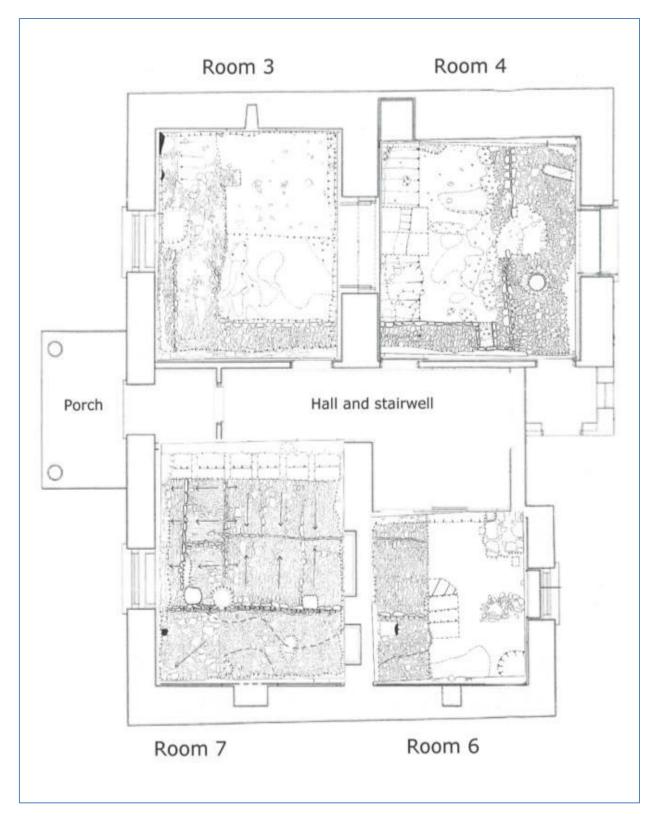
Plan showing the architect's ground floor plan of Stewards House with the recorded plans of the cobbled floors, earth and mortar floors, Civil War and later features inserted in to the current, overlying buildings' footprint.
